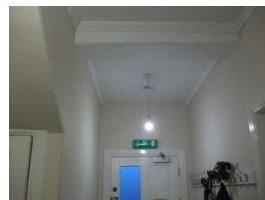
The cupboard off the top landing should be kept locked and any secure fastenings should be such that ensure that the door sits tight against door rebates.
